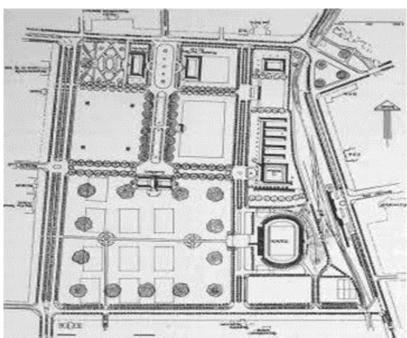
Site Plan of Medan Merdeka Garden (Source : Google, 2024)
